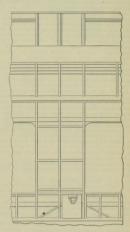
Window Panel Framing, and Truss Over Bolster
